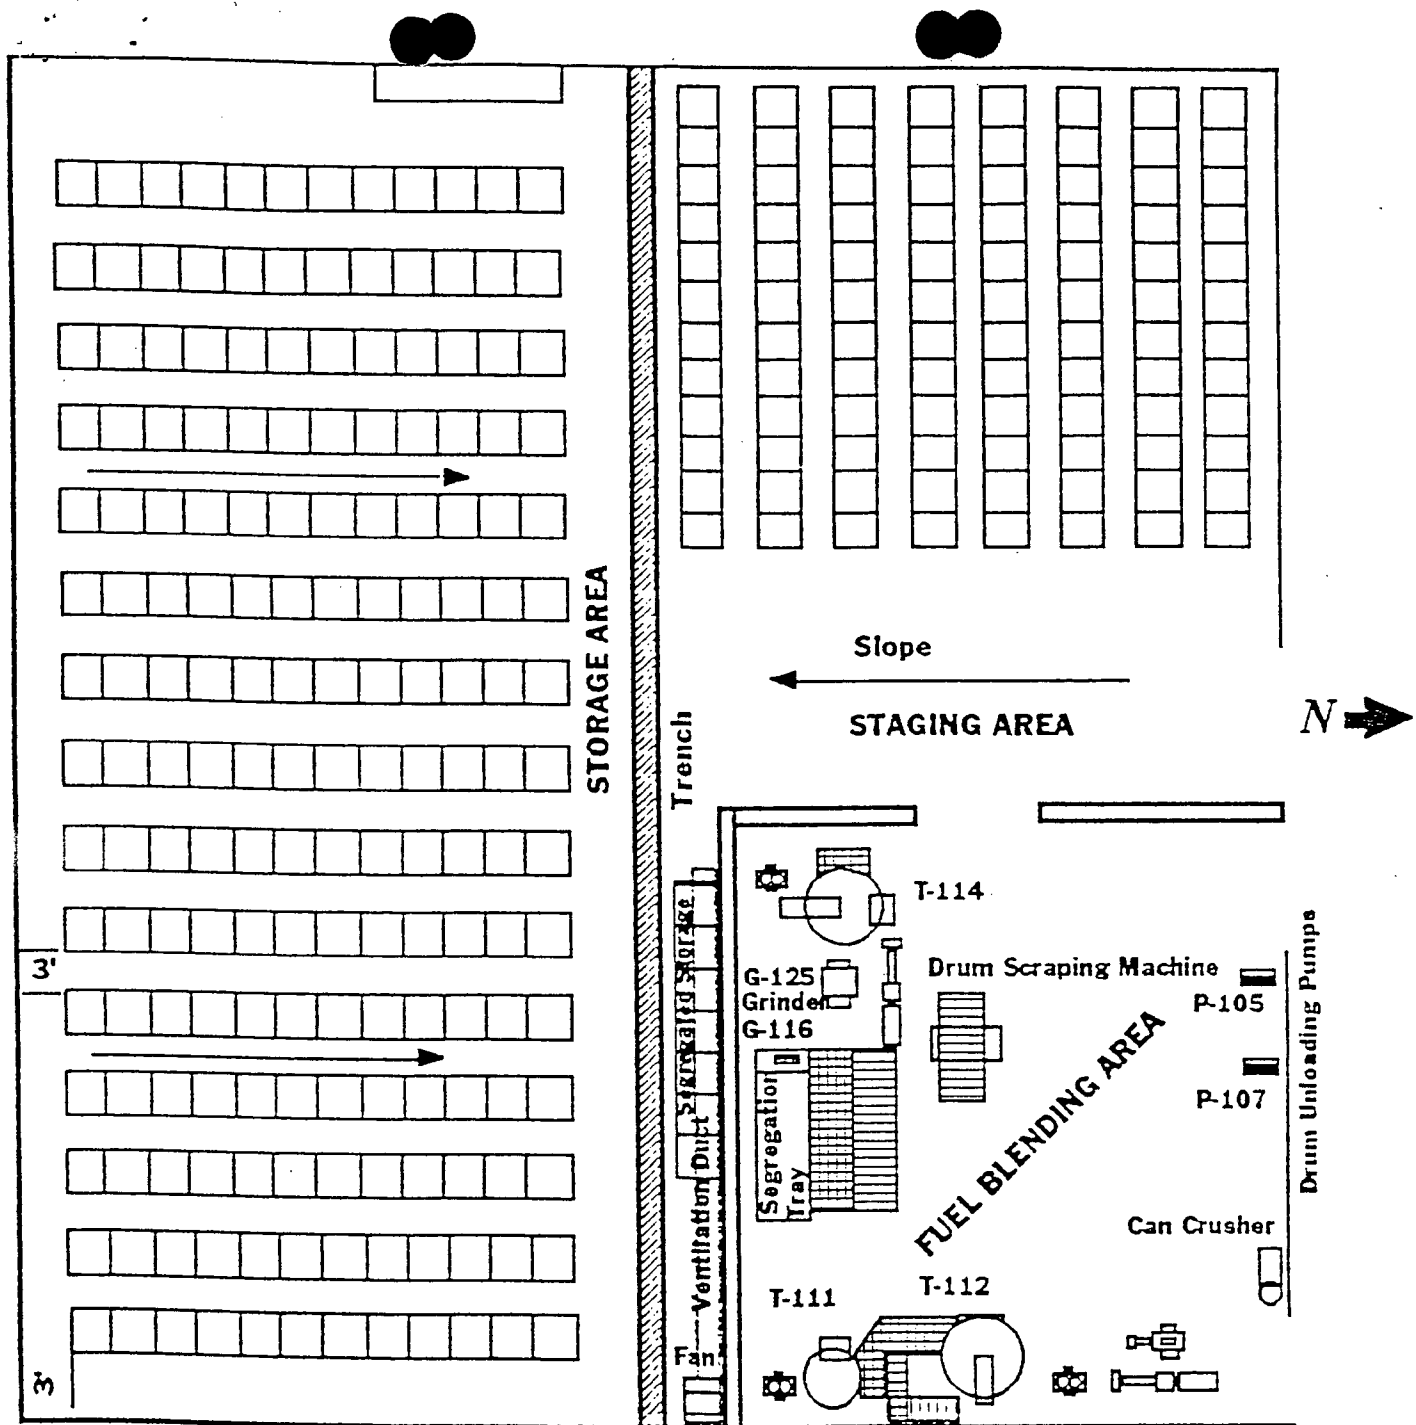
Arrangement of Pallets within the Drum Storage Building
